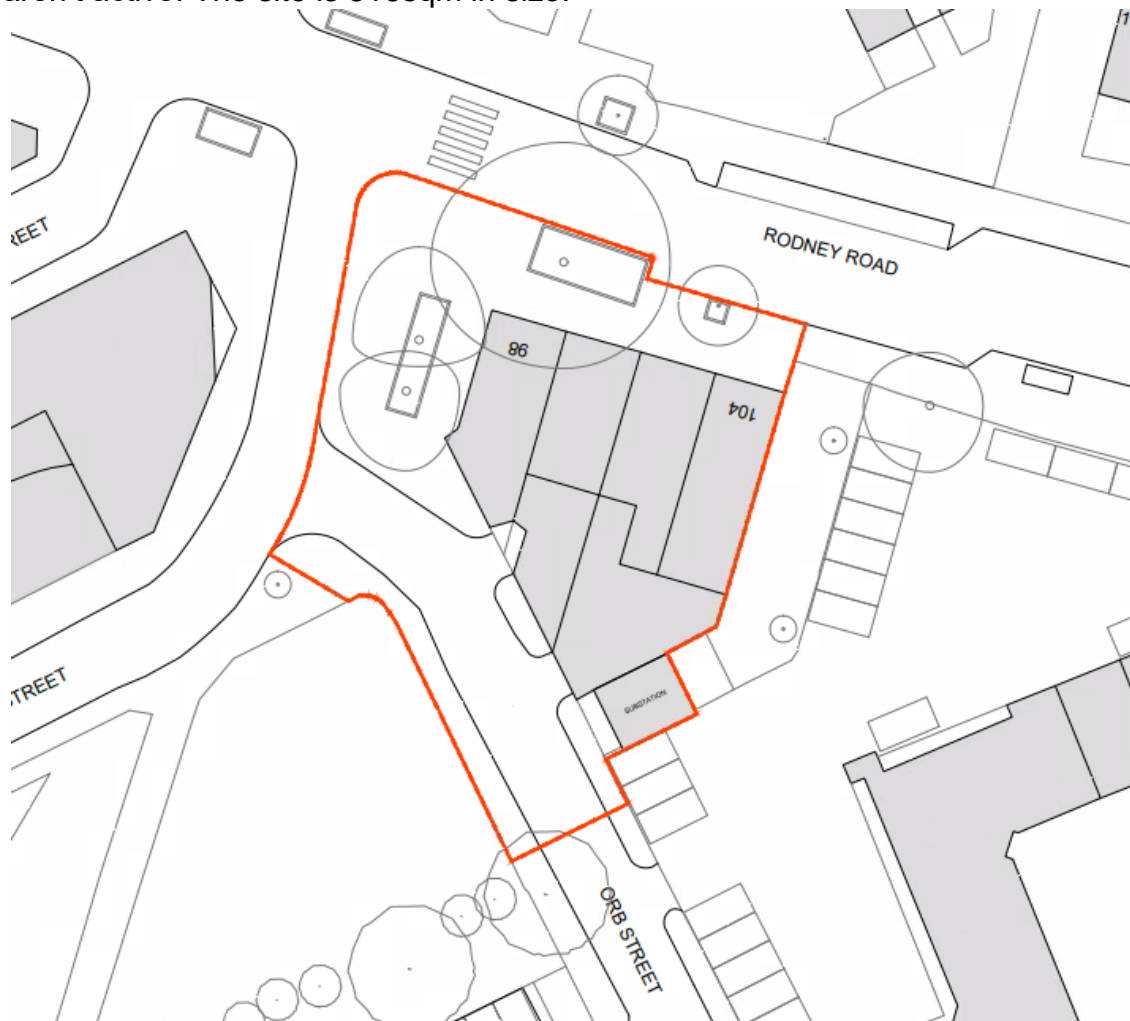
(above): Site location plan, showing the site boundary edged in red.
